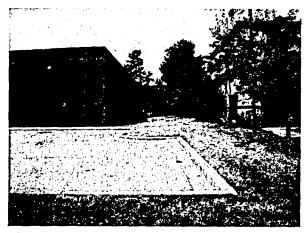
Photograph of the back side of the on-site building, facing west from northeast site boundary. Note north adjacent Citgo gas station.
